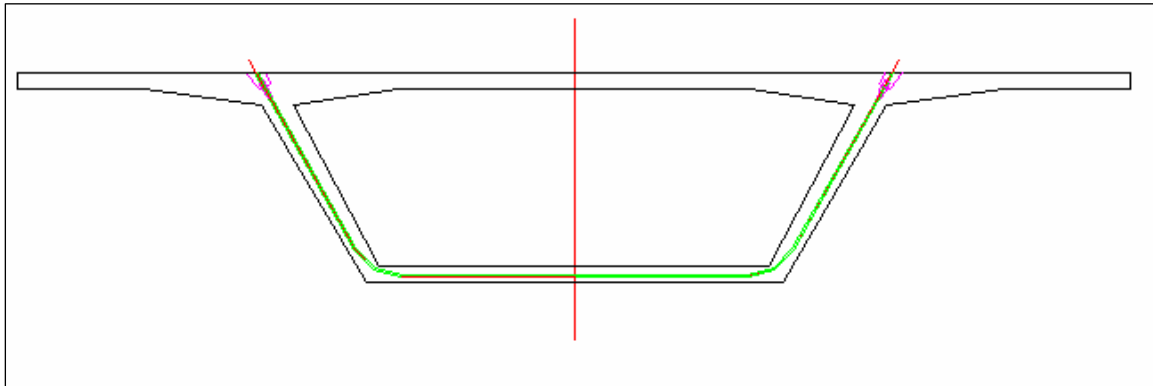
Proposed Monostrand Path in Typical Segmental Box Girder Bridge
